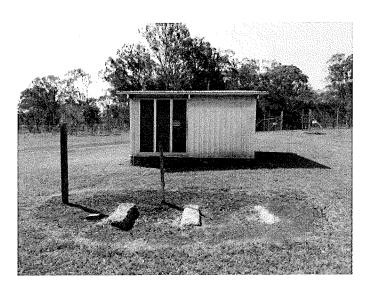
ACMA Facility, Birkdale Generator shed fuel tank remnant structures, facing north west.
